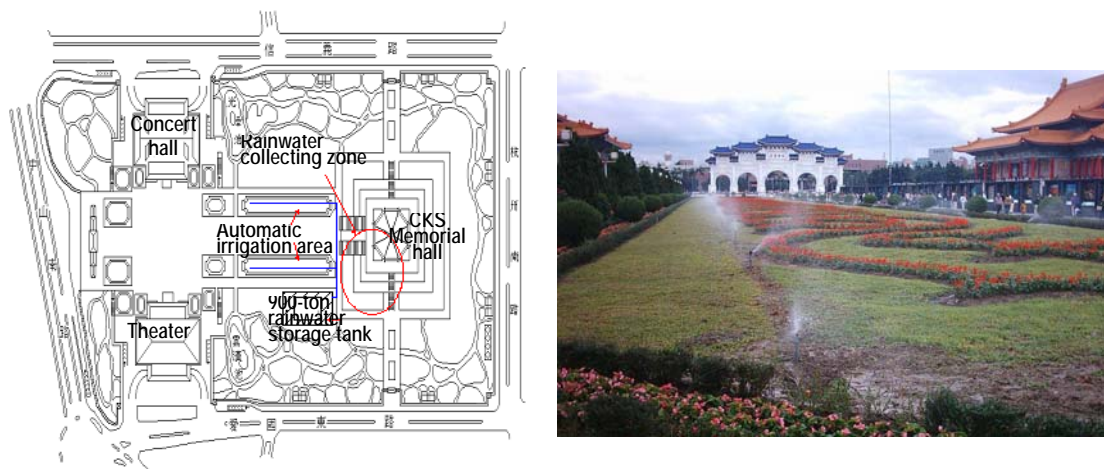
Rainwater utilization system in Chiang Kai Shek Memorial Hall (Left: Site plan; Right: Rainwater storage tank and relevant facilities installed to substitute tap water irrigation)
